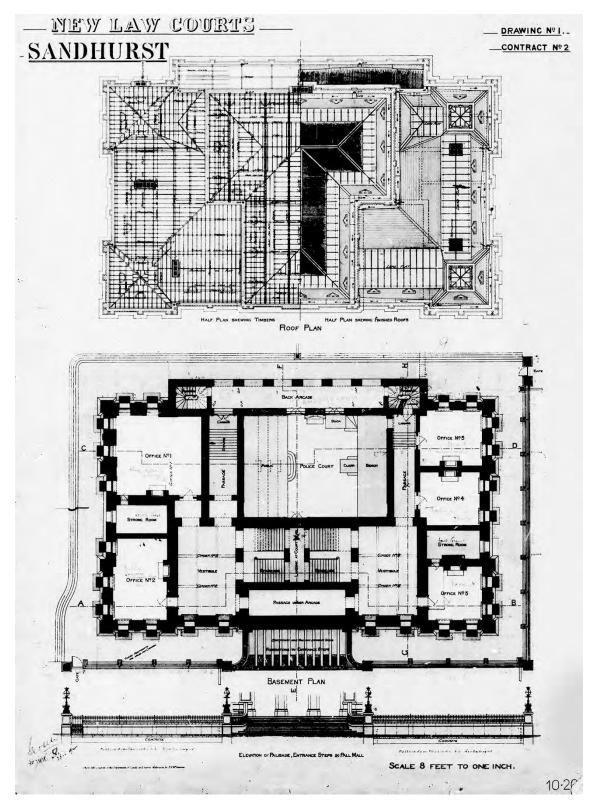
New Law Courts Sandhurst, Floor Plan and Basement Plan, Drawing No. 1, Contract No. 2 Source: Public Works Department, PROV LCB 10.20
